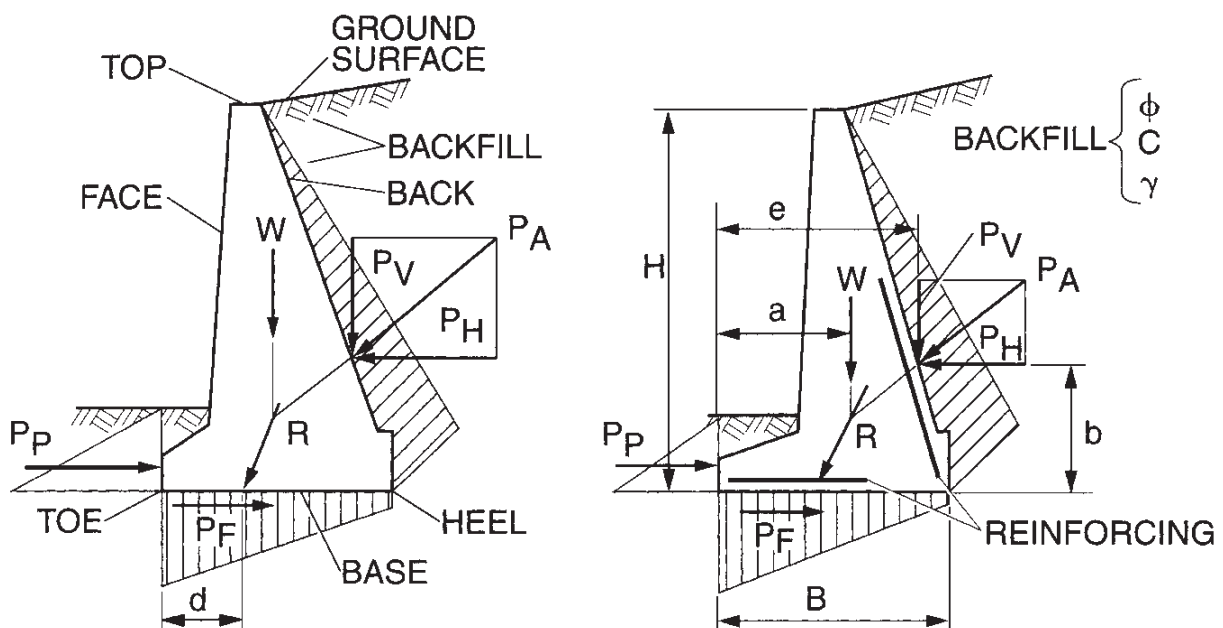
Gravity and semigravity retaining walls. (Reproduced from NAVFAC DM-7.2, 1982.)
